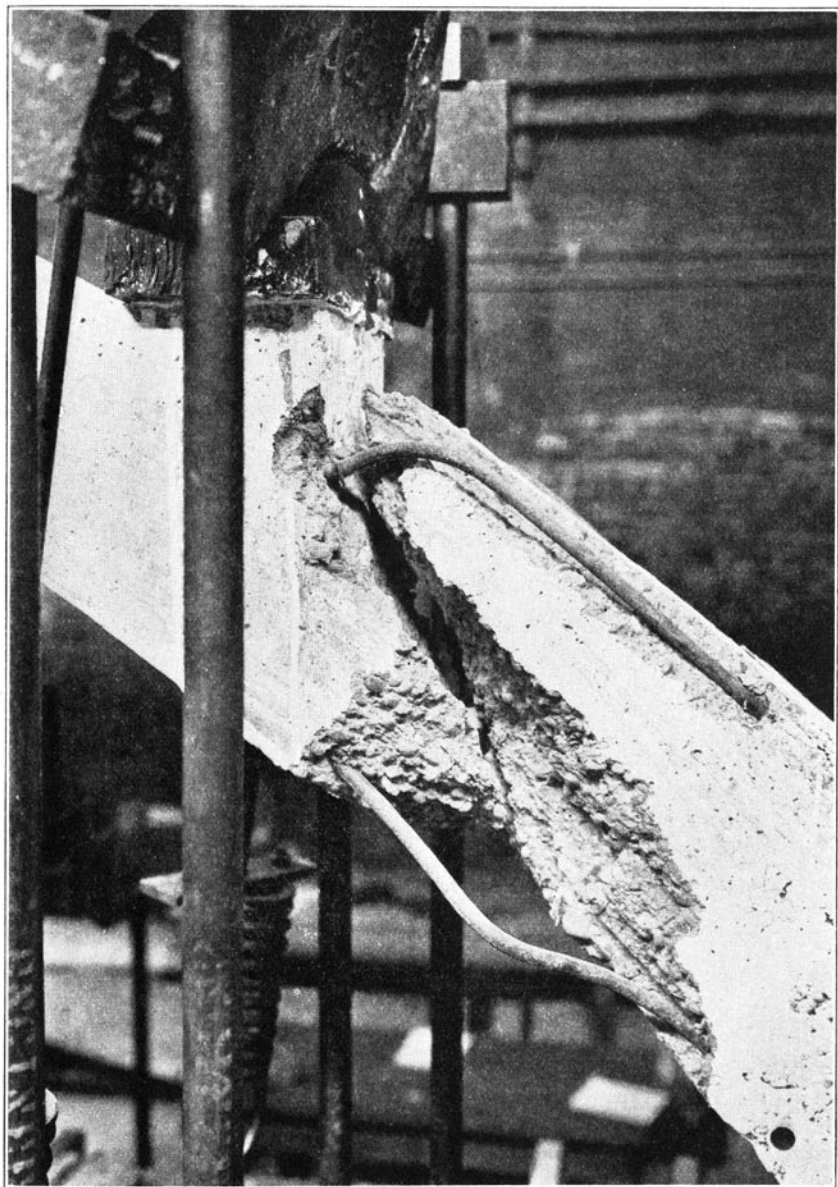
FAILURE OF ARCH 26-2 AT S2
